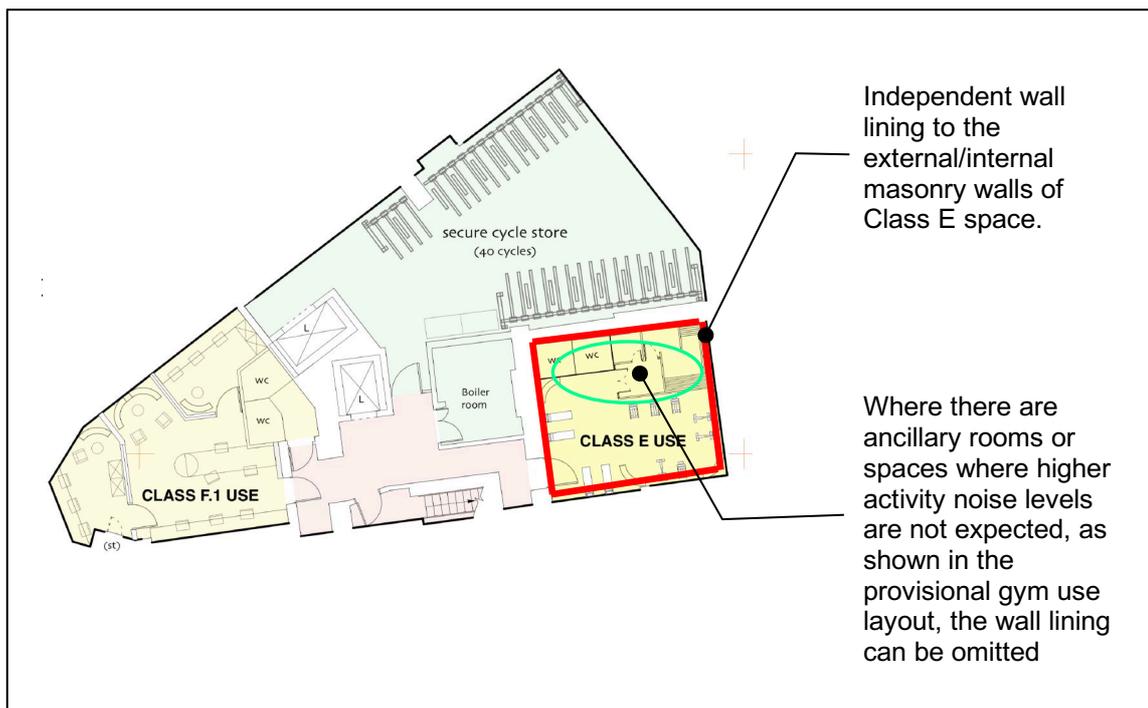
Basement floor plans with location for the independent wall linings on the external and internal masonry wall as required to achieve the higher D_w 60dB sound level difference
